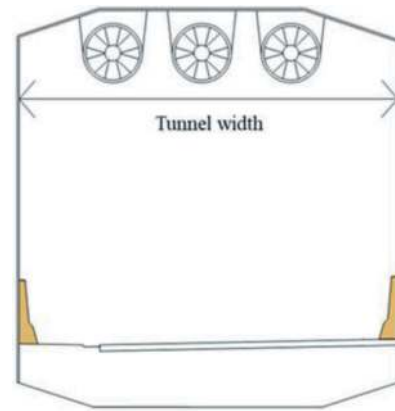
Spatial constraint of jet fans in a single lane tunnel cross section.
